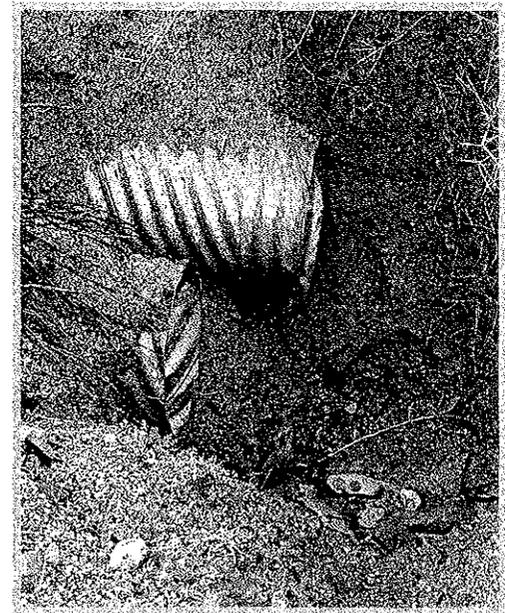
LOCALIZED EROSION AT UNPROTECTED CULVERT OUTLET
